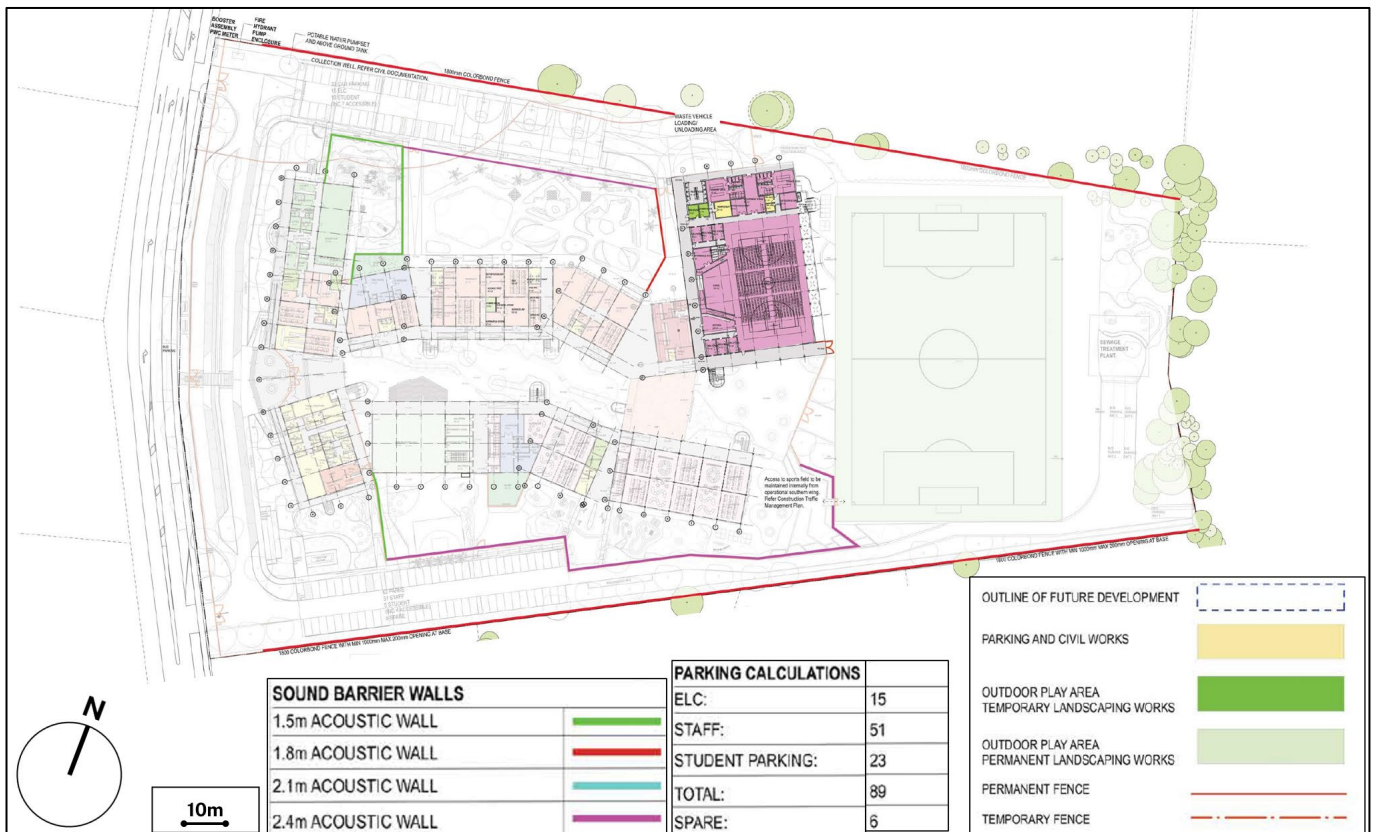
| Stage 4 Ground Floor Plan (Source: Applicant's AR, 2024)
